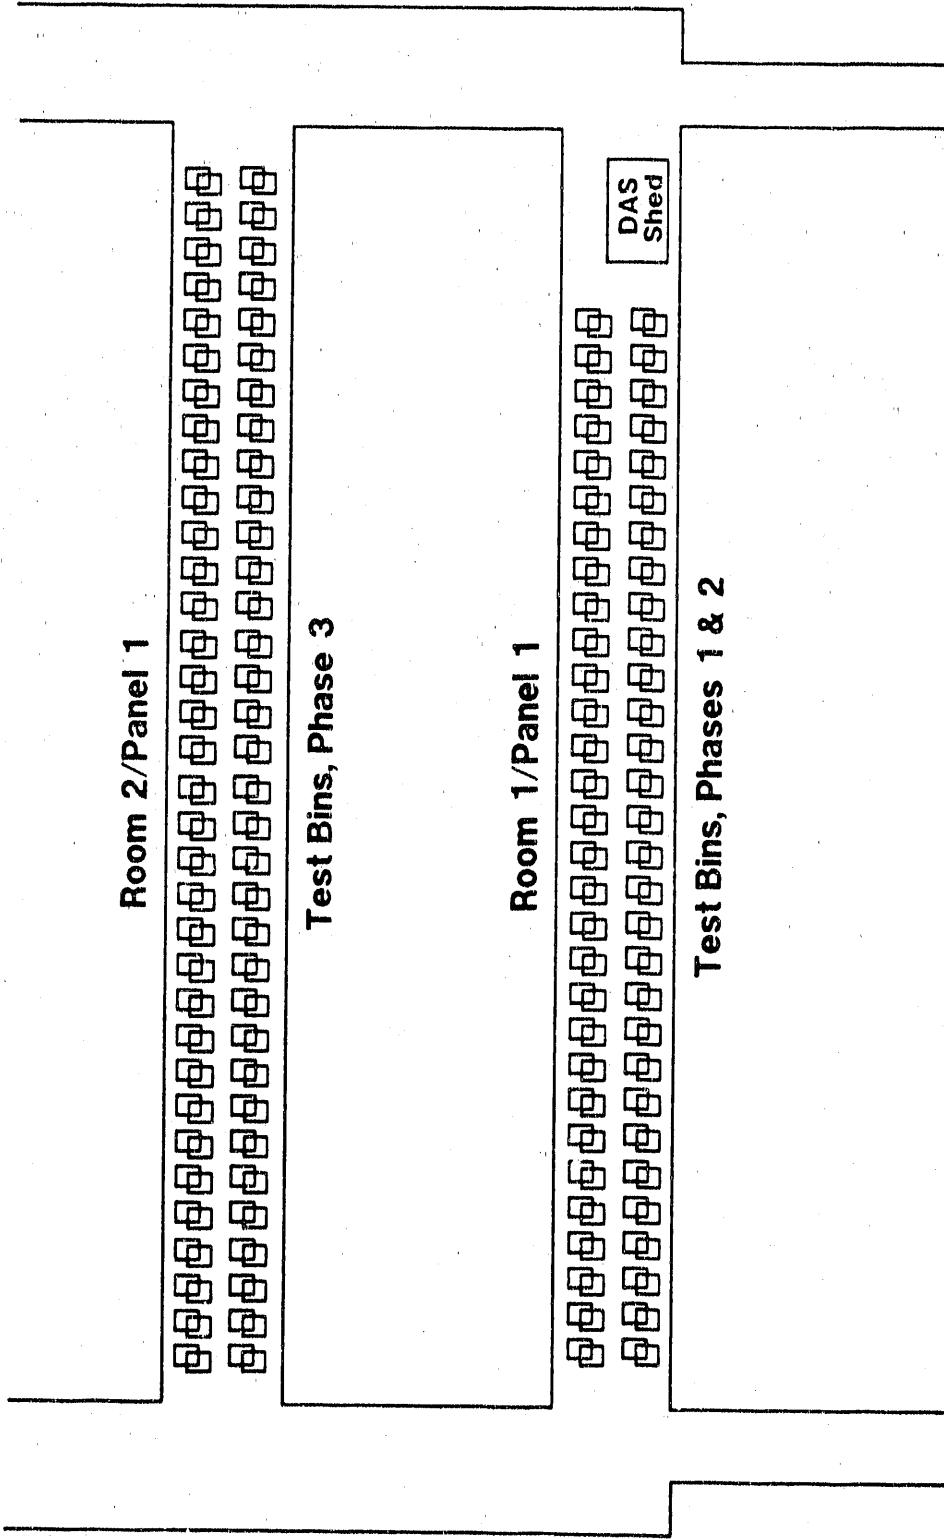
WIPP Bin-Scale Test Room, Plan View
